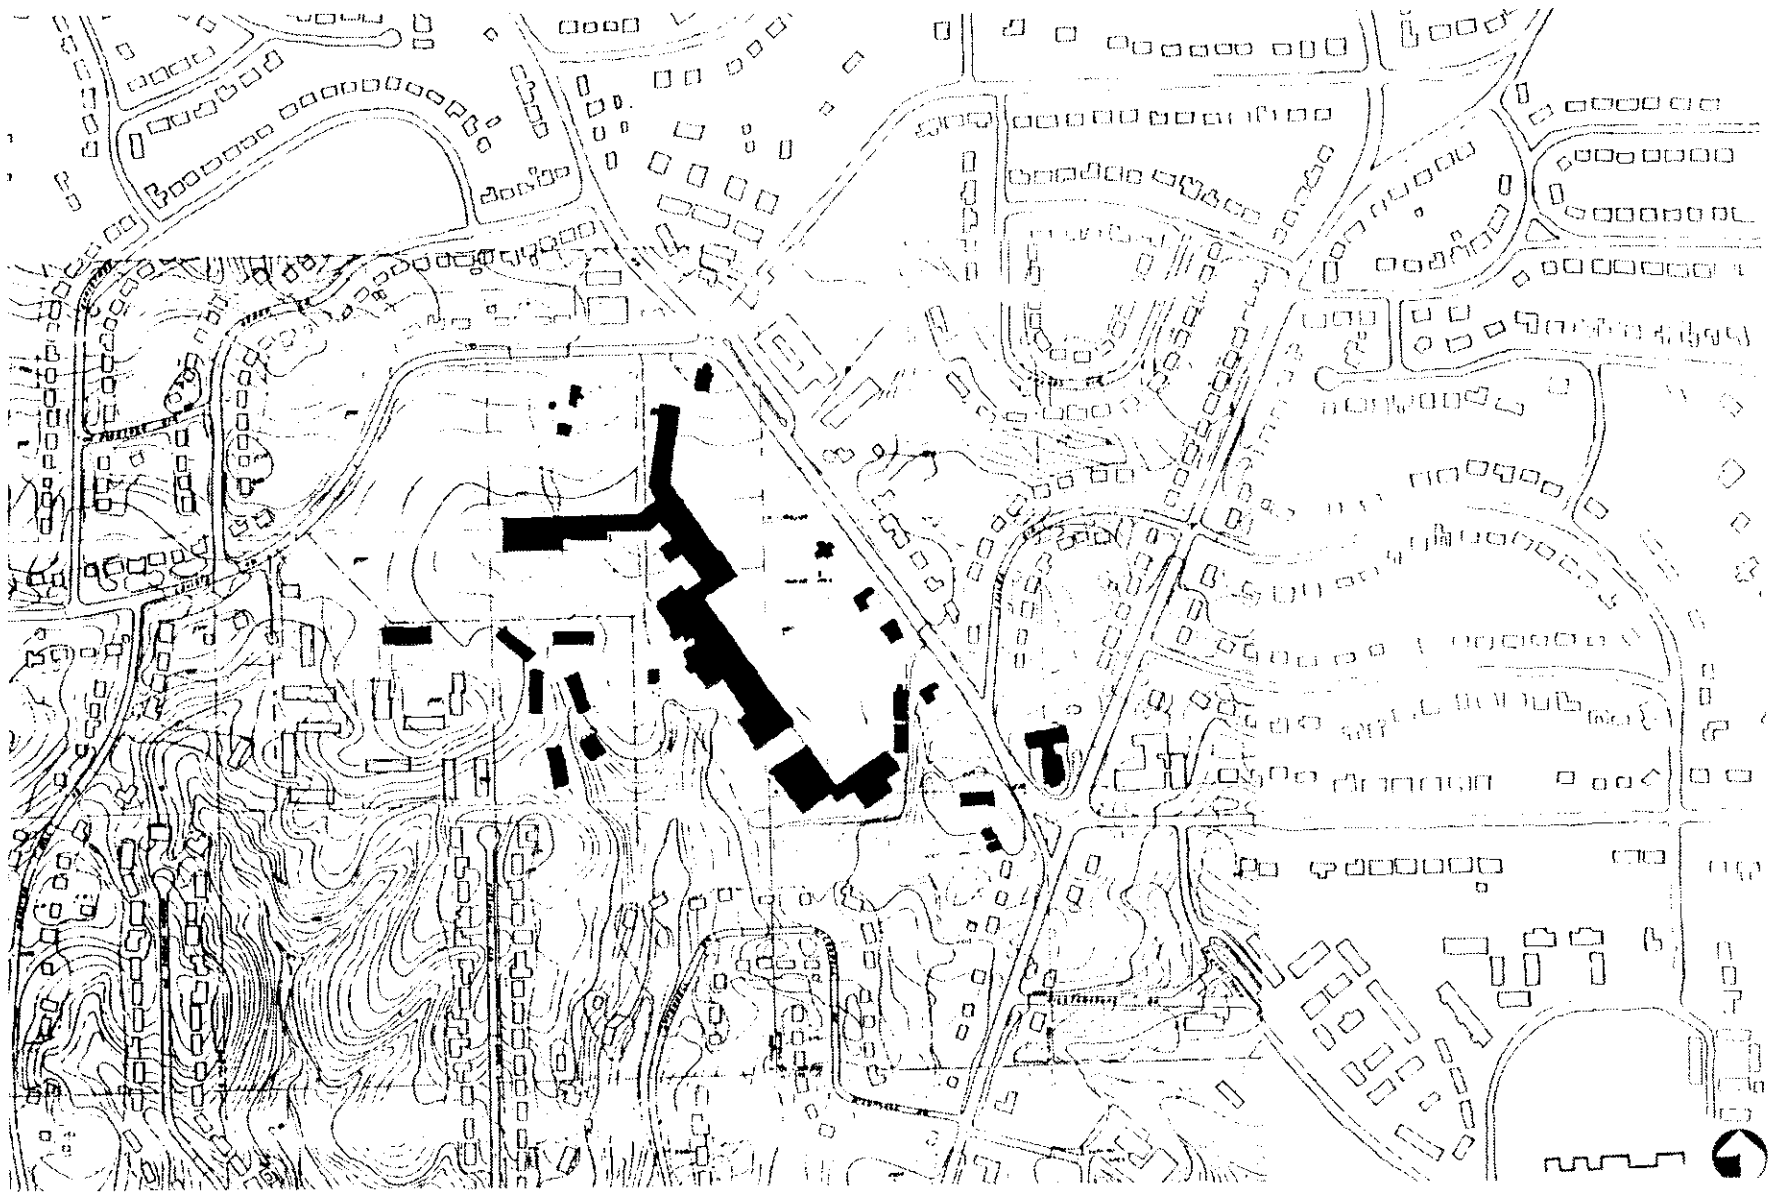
Existing Site Context 1:200 (Indicating Buildings and Roads)
